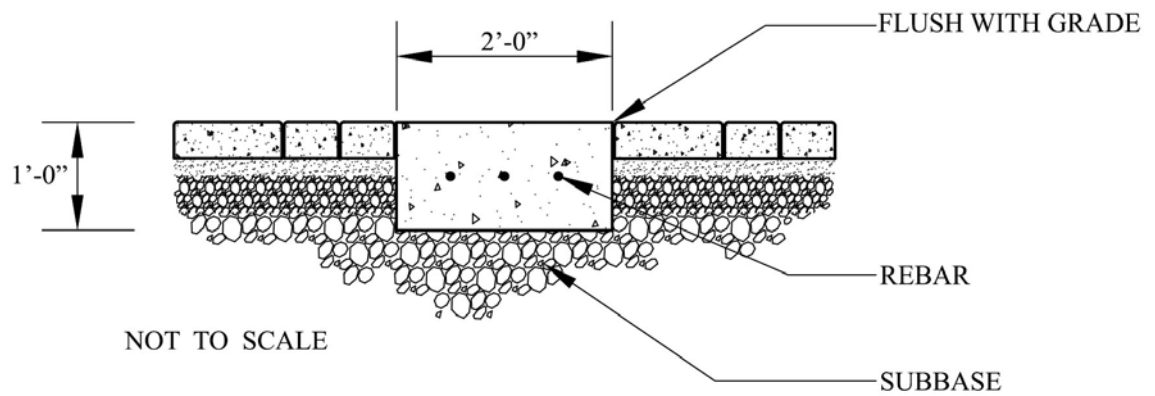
Concrete Edge Restraint Detail, *image by Author.
